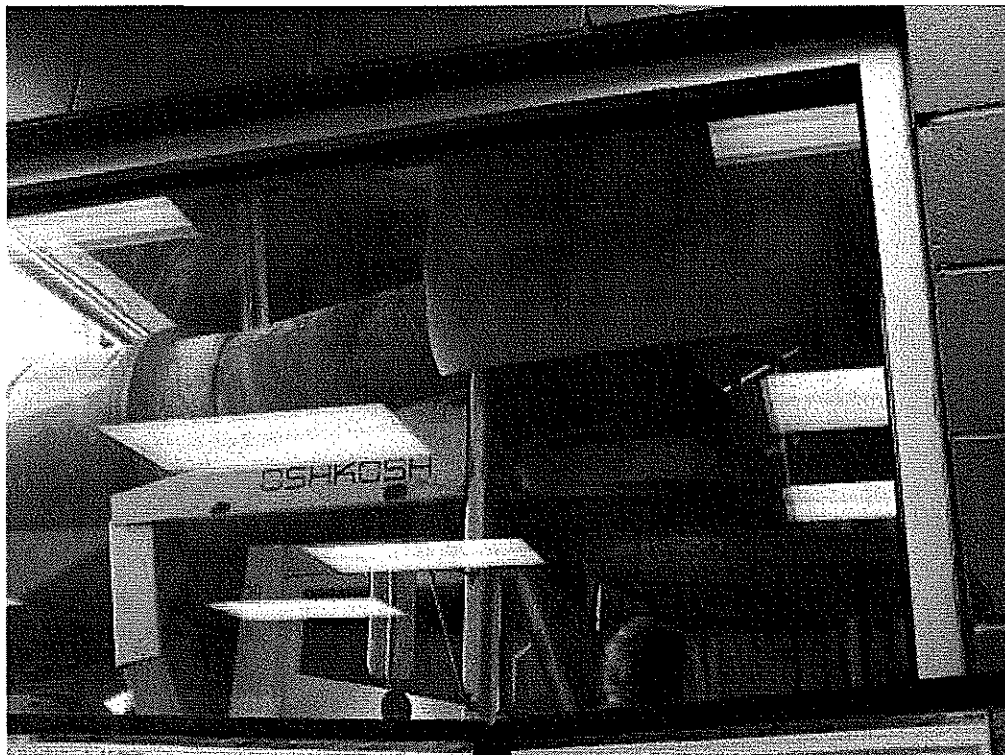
(Photo 3) : Loadout of cement mixing truck, in process.
